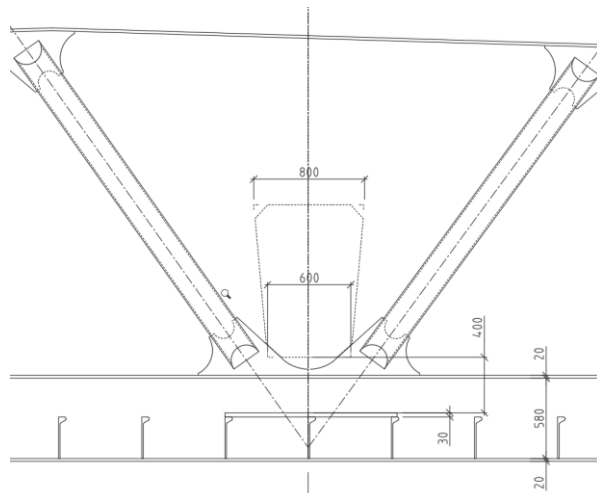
Outline for manhole in Transverse truss for 9600 mm column
